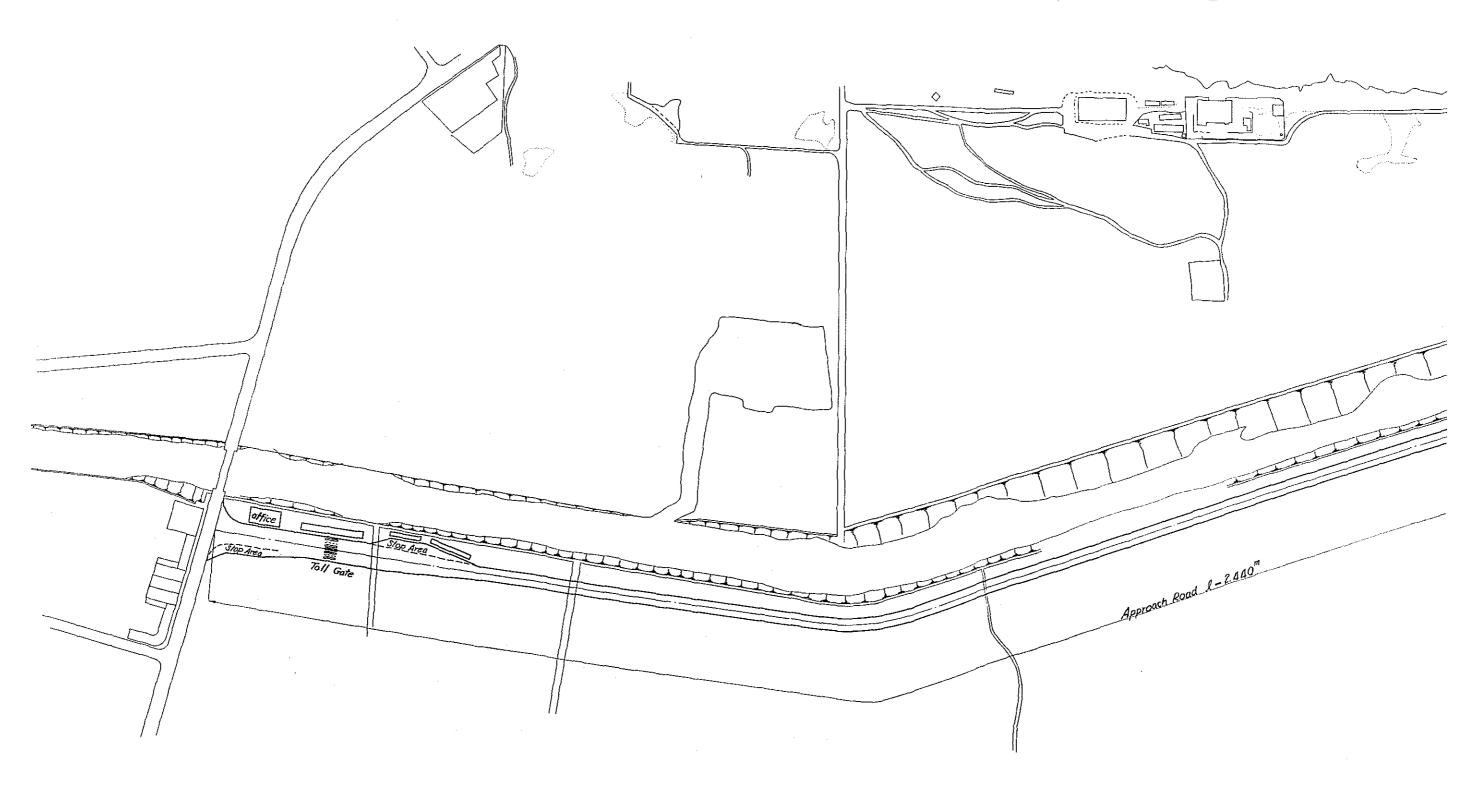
^{-2} Planc of Barranquilla-Bridge (No. 2)
